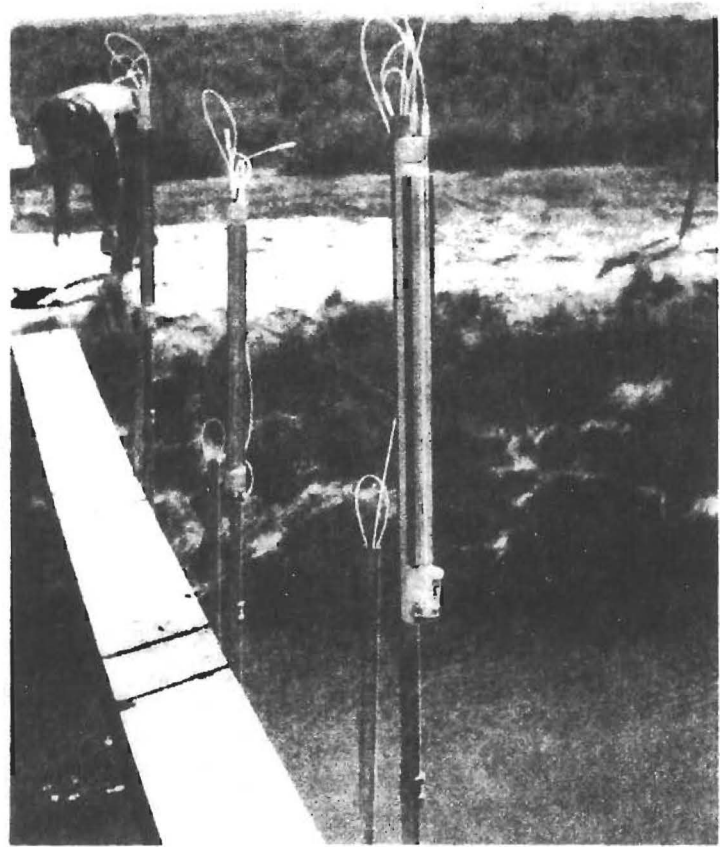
Manometer units mounted at the top of piezometer tubes which are driven into the bottom of an operating canal.
